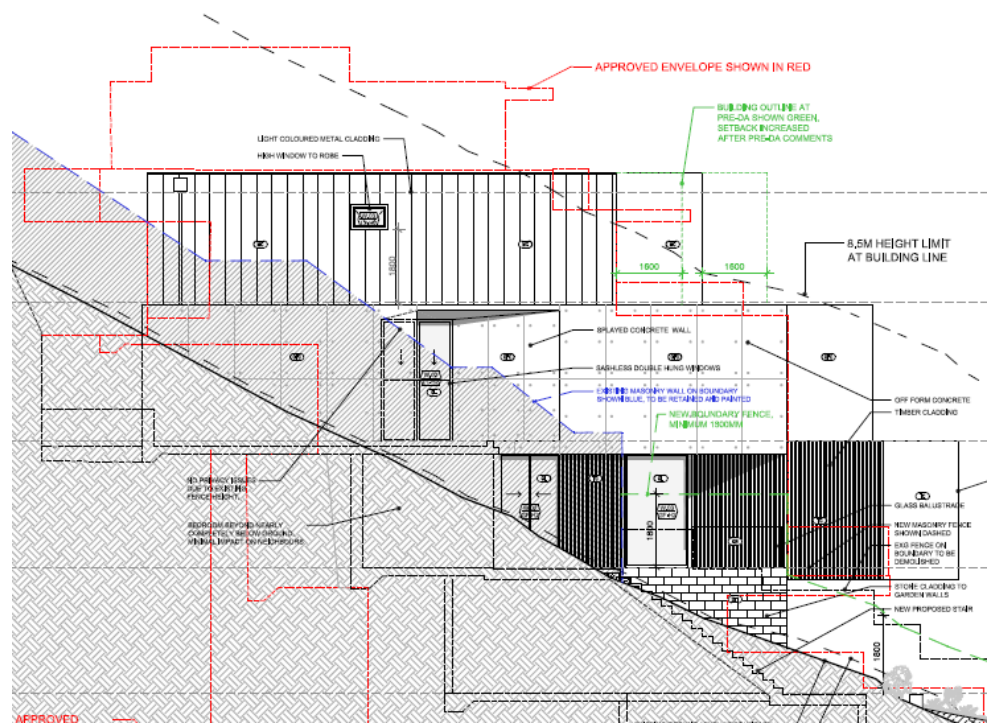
Plan extract Western Elevation showing 8.5m height breach
